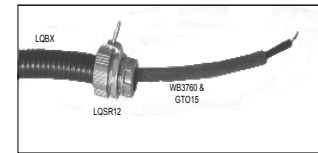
You are now ready to make connection between GTO cable and electrode using either Wetbits Short Sleeve or Wetbits End Cap. Make sure to leave at least 5 1/4 in. of GTO cable and WB3760 assembly standing out for connection with Wet Bits End Cap Wide.
